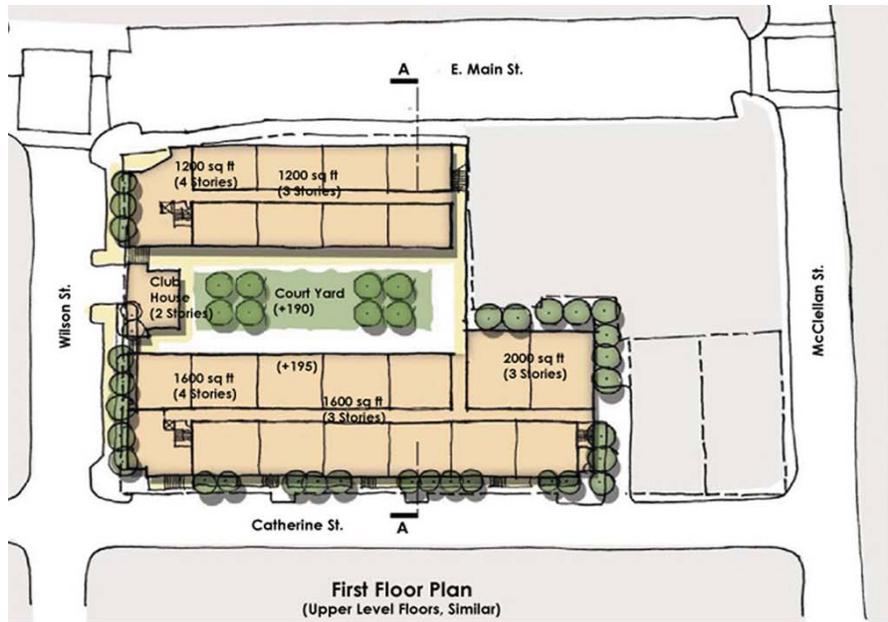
Plans and Renderings, Opportunity Hill Site Scenario 2
